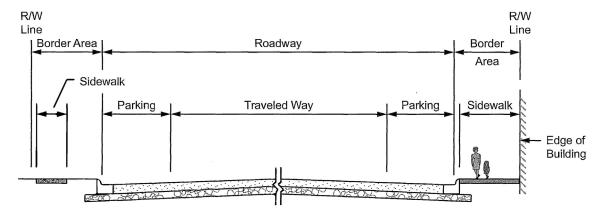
Urban Area with On-Street Parking and Sidewalks
